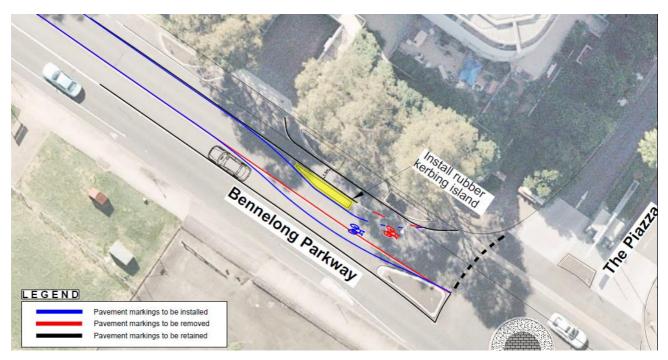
Current concept plan of the proposed traffic facilities on the eastbound approach to the roundabout in Bennelong Parkway at The Piazza, Wentworth Point
